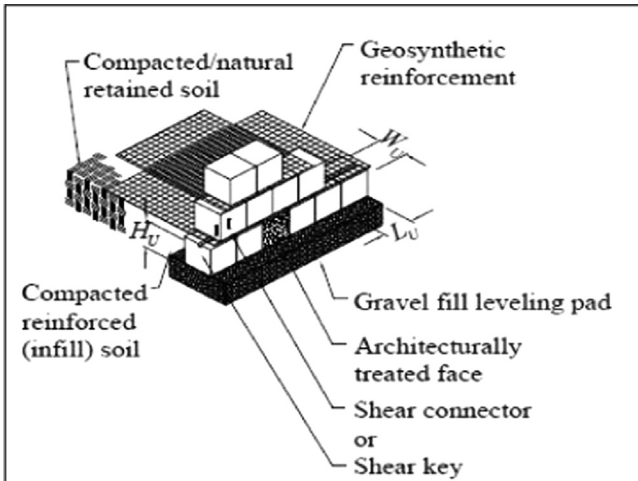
A typical geosynthetic reinforced segmental retaining wall (NCMA, 2010).
